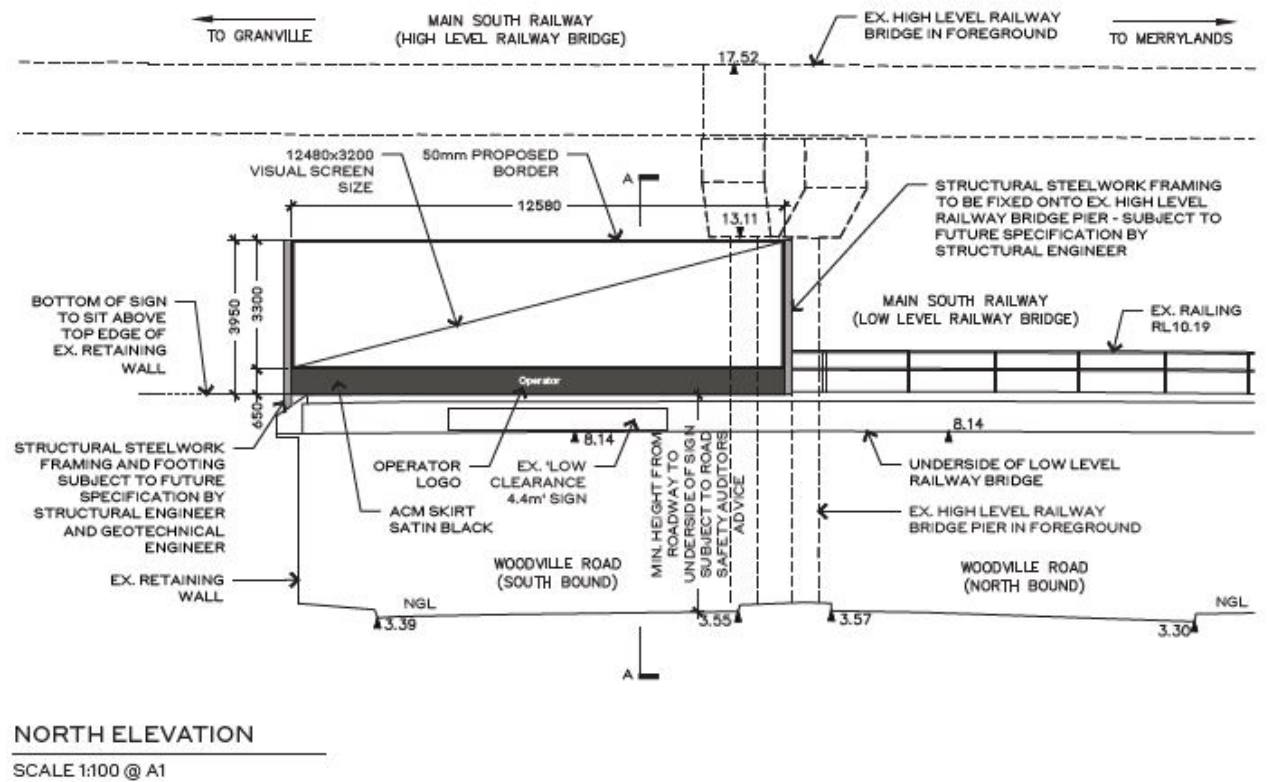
| An elevation of the proposed southbound sign known as Sign 2 (Source: Applicant)
